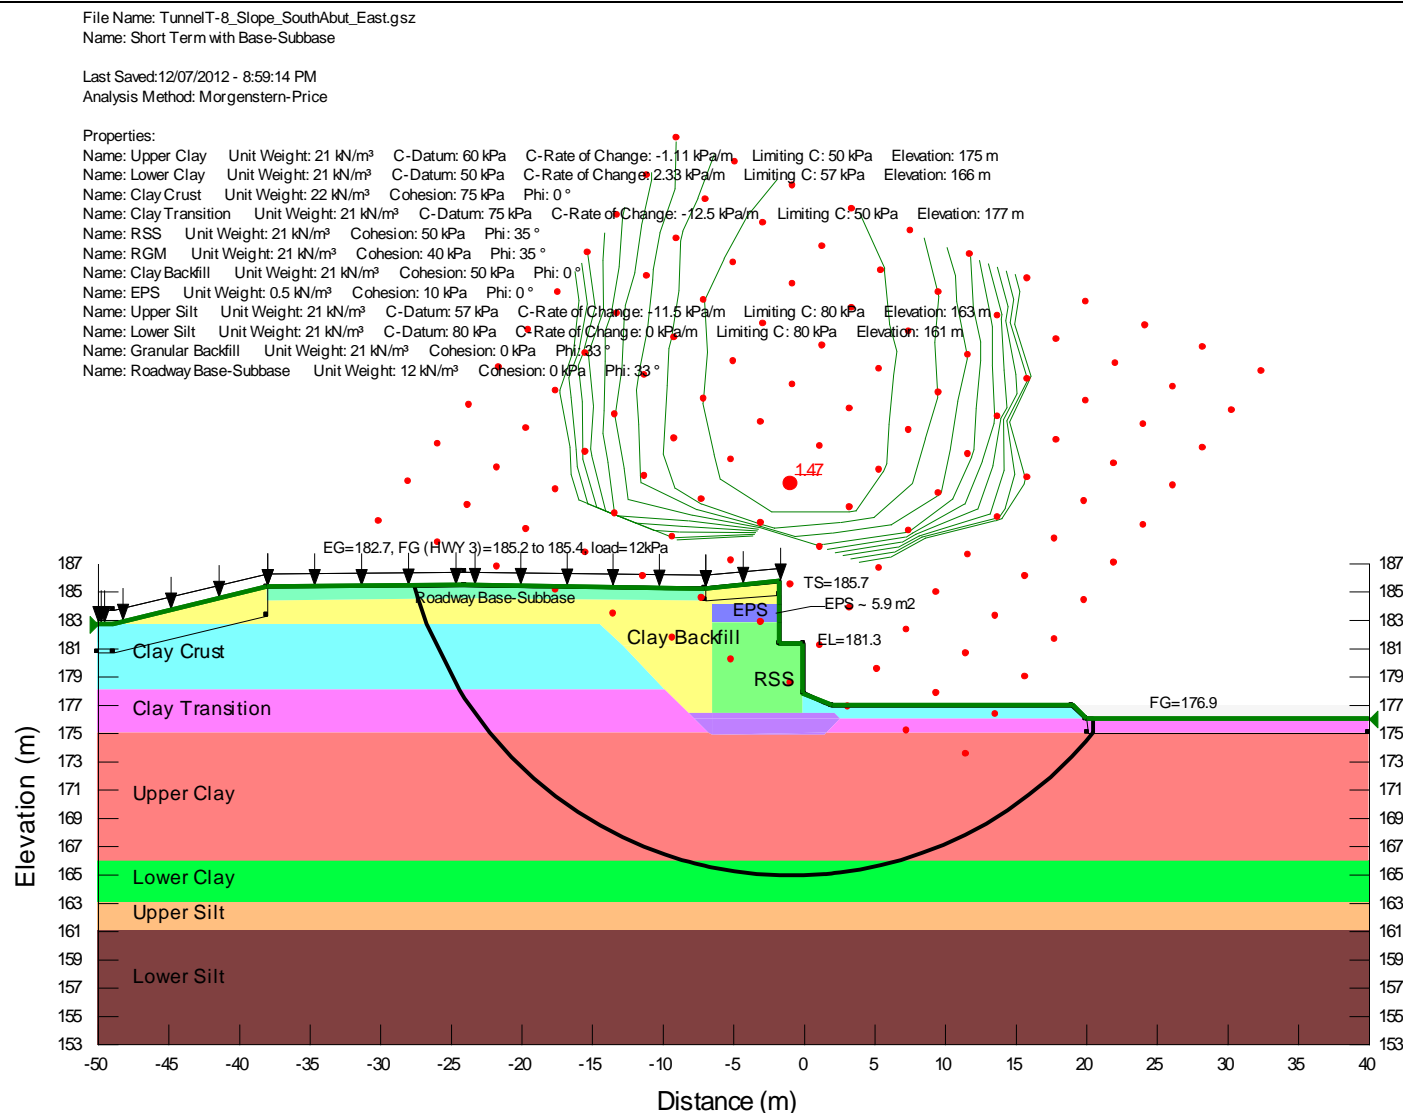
Global Stability Result – South Abutment (East Segment) – End of Construction (Undrained) Loading
